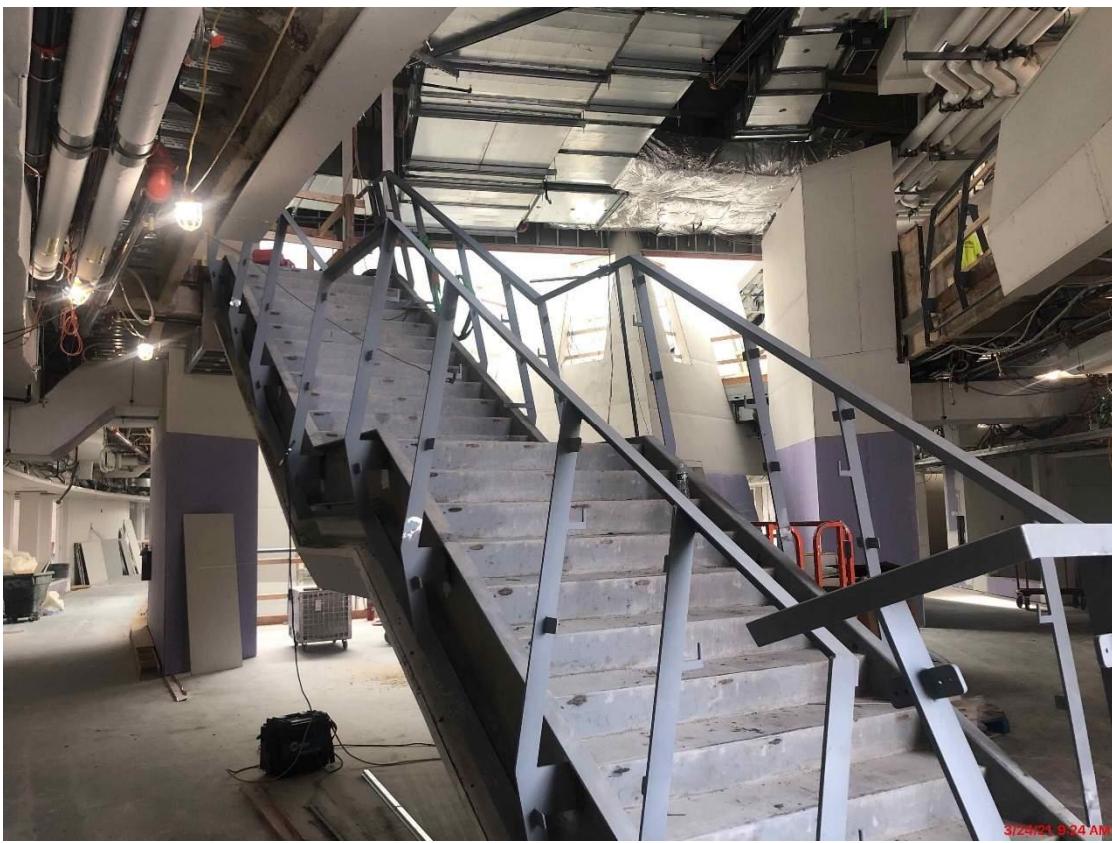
Stair 6 railings being installed in Building Area C 2nd Floor
